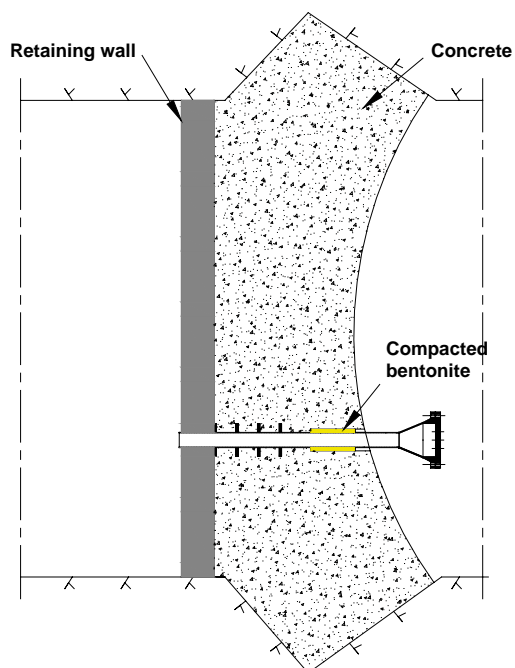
A schematic drawing of the plug with the cast concrete dome and the prefabricated concrete beams behind, making up the retaining wall. (Left figure in Figure 2-1 in Johannesson and Hagman 2013.)
